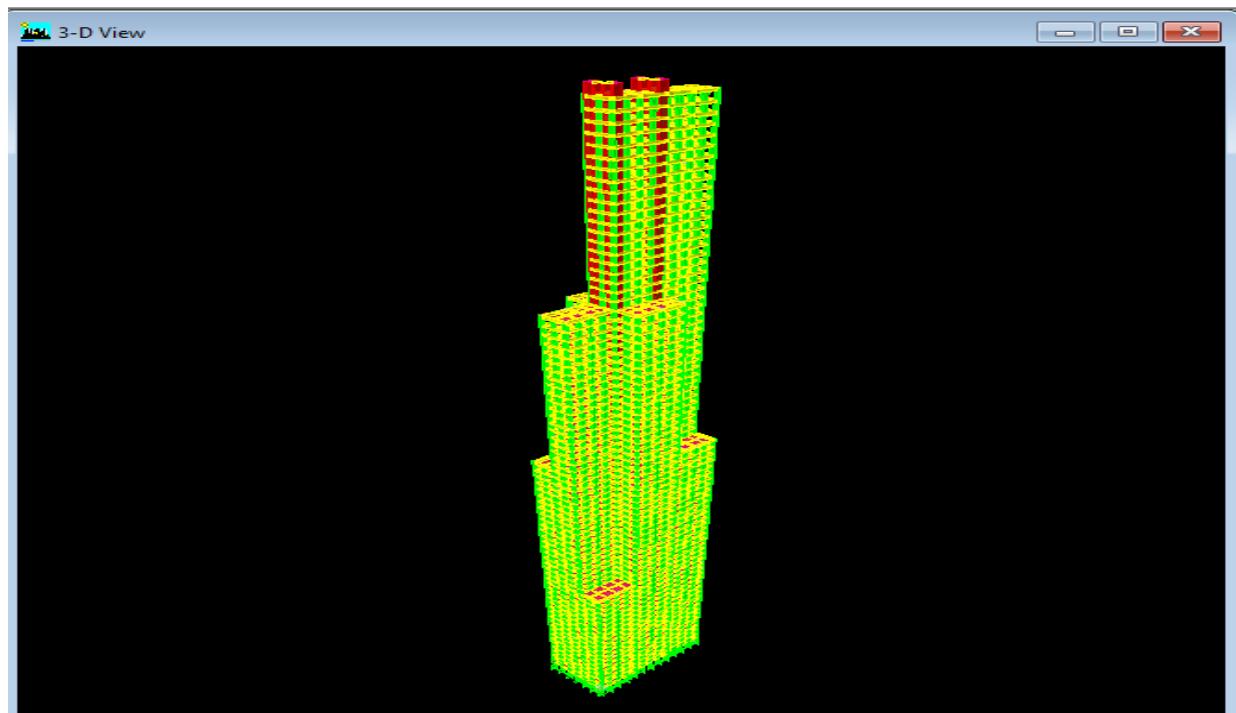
(b): 3-D view of 80 storied Bundled Tube structure building
